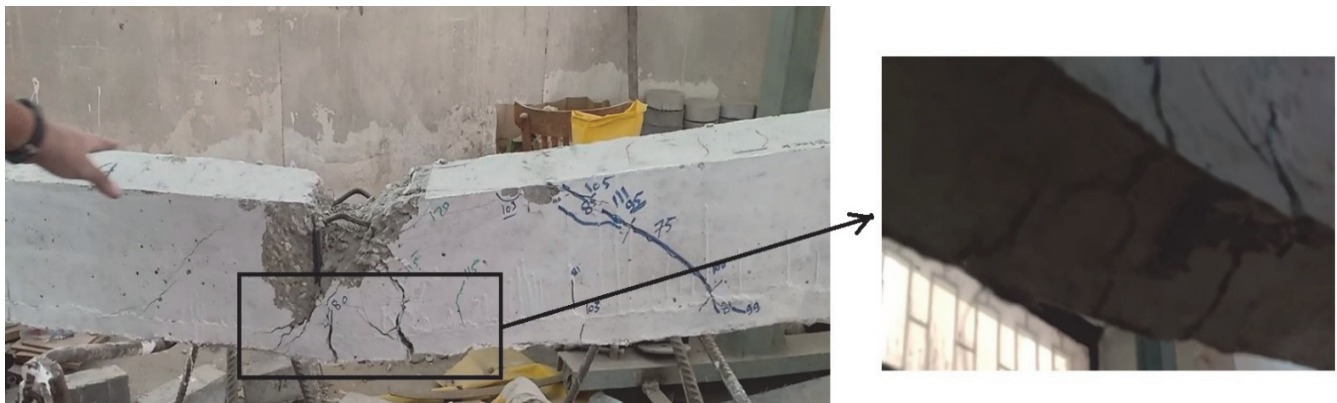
Concrete crack patterns at ECC beam (B 04) explain ECC plate rupture at tension surface.
